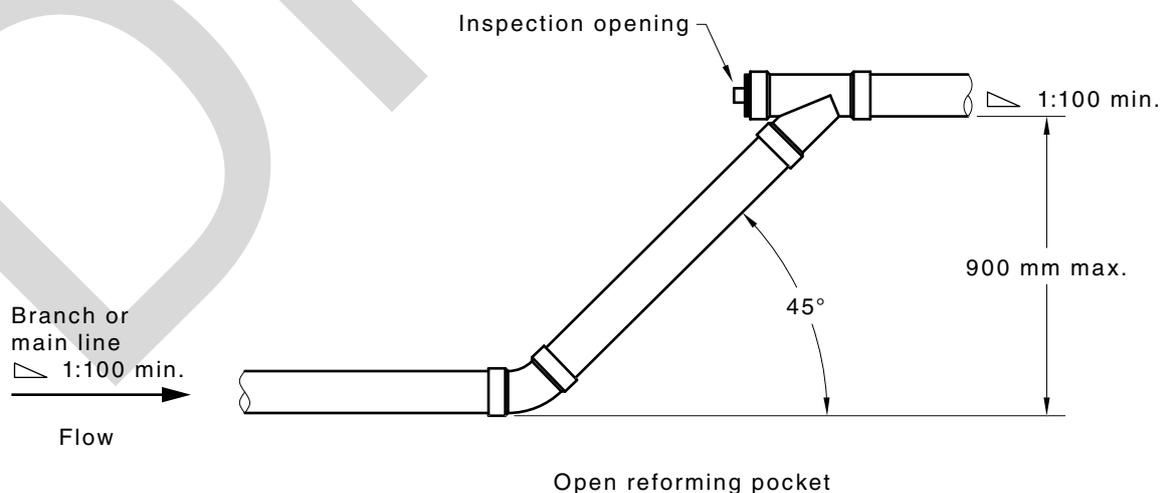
TYPICAL OPEN TYPE VACUUM REFORMING POCKET
